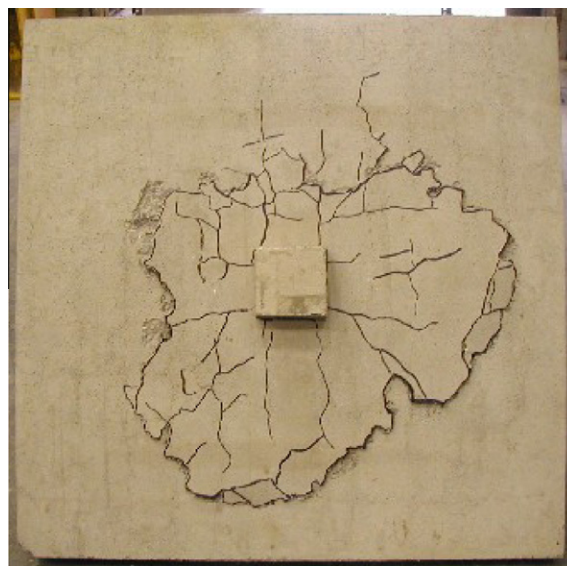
Punching shear failure cracks on slab S (bottom face).
